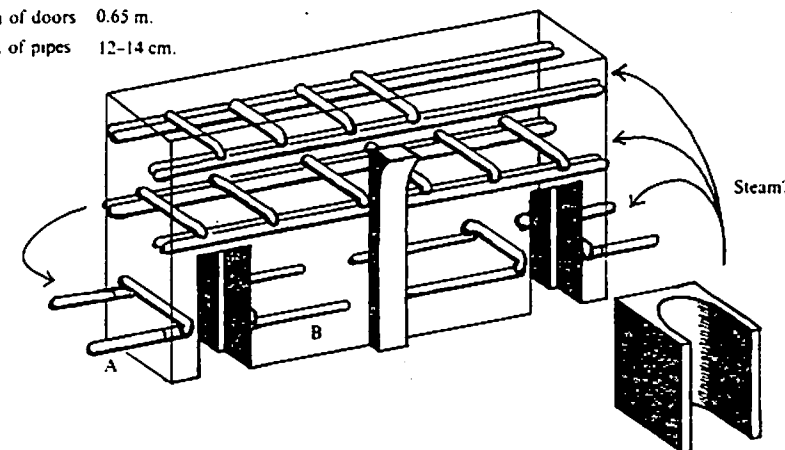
Wall with internal systems of pipes built across the former 'Great Vault' at Qartmin, now called the 'Bath House'. The wall is represented as partially diaphanous. The pipes are lined with waterproof mortar. The precise way in which the lateral pipes were linked with those at right-angles to them is unclear because of damage, nor has it been discovered how the three systems were related. The parallel pipes suggest circulation; perhaps the horseshoe-shaped furnace which was discovered nearby with ash in it was used to heat water, so that steam could circulate in the wall. The great blocks of stone of which it is built would retain the heat and radiate it into the rooms on either side. This explanation, suggested to me by Simon Ellis, would make this a unique example of such a technique. When the observations underlying this reconstruction were made (in 1978), the lowest part of the wall was covered in rubble and of the lateral pipes only those marked A and B were actually recorded, the rest of the lateral pipes at that level being supplied by conjecture. Since then the rubble has been removed, though unscientifically, and the lower pipes have been sealed with cement.
